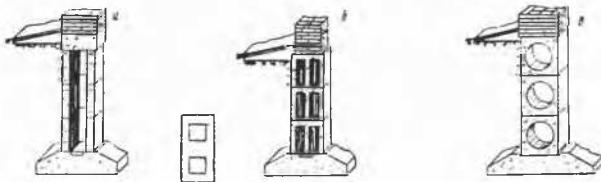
b Precast strip foundations with hollow reinforced concrete wall blocks.
